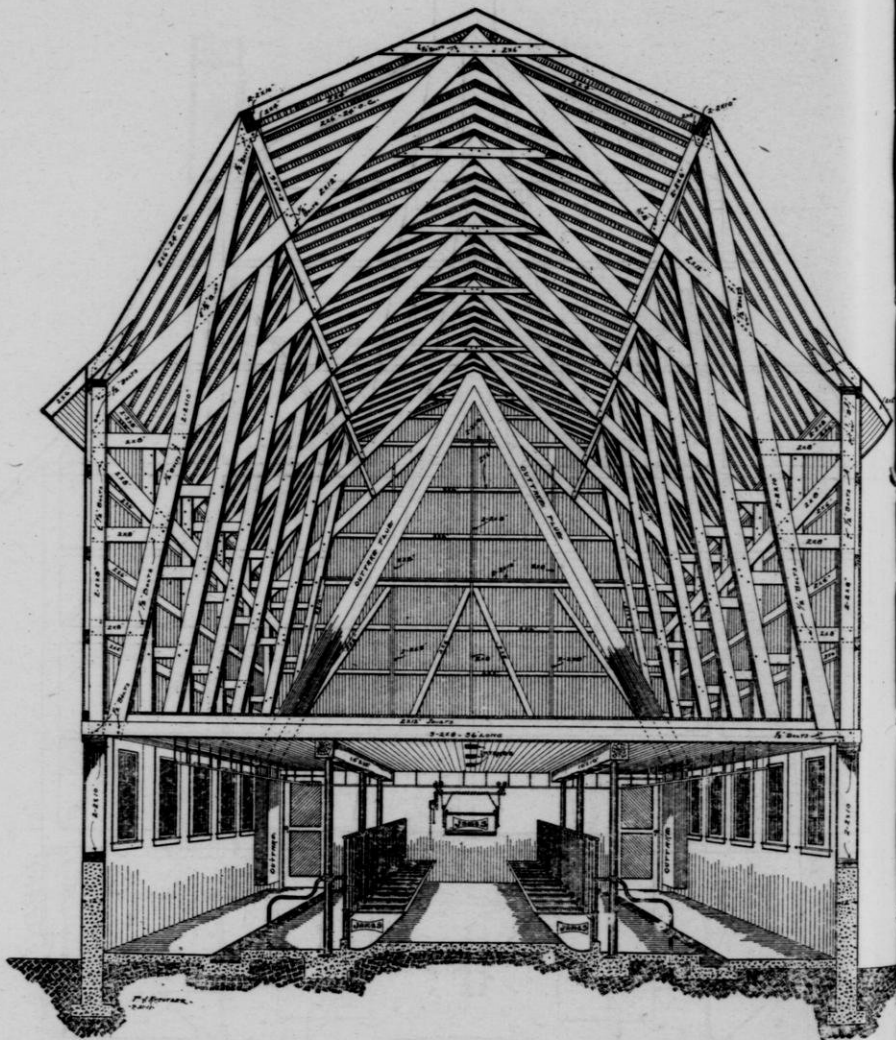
SHOWING STYLE OF PLANK FRAMING.
